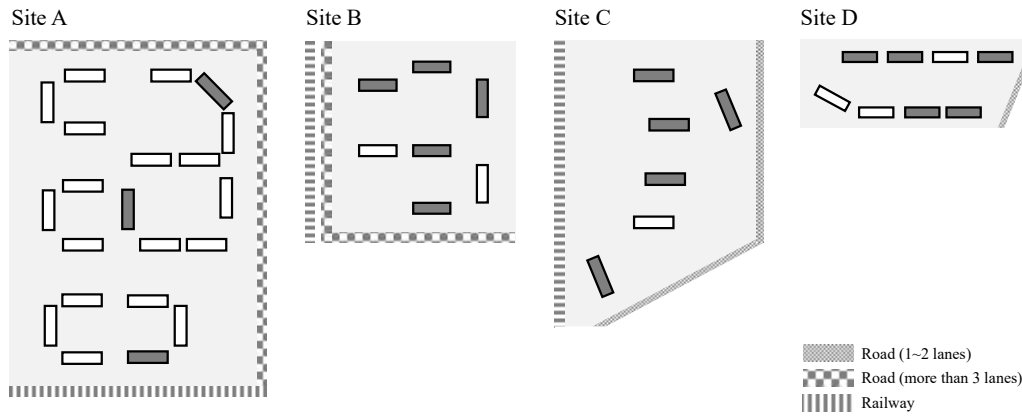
Site plans of four apartment complexes. Grey boxes indicate the buildings where the outdoor noise levels were measured.
